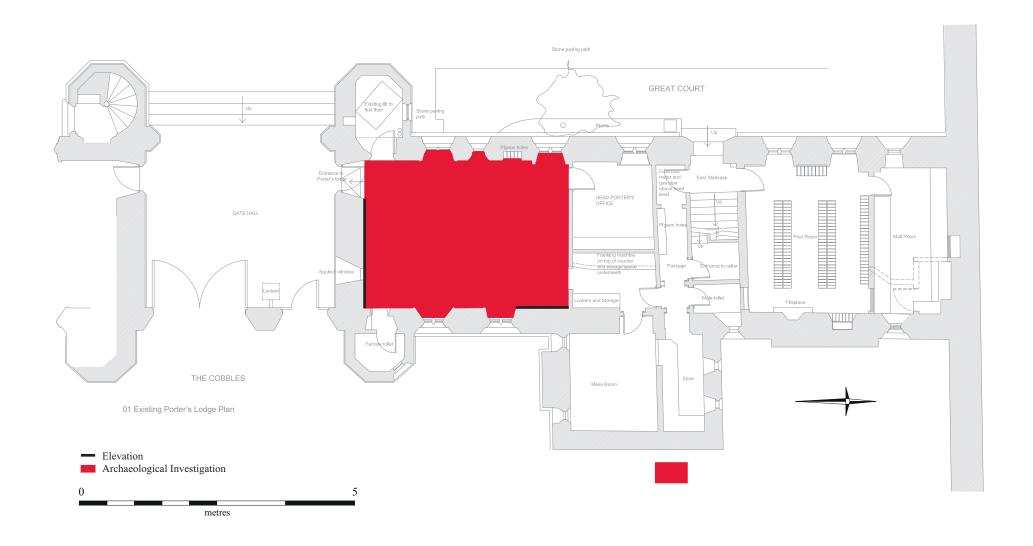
Area of excavtion and location of elevations on the existing Porter's Lodge plan (provided by Donald Insall Associates Limited)
